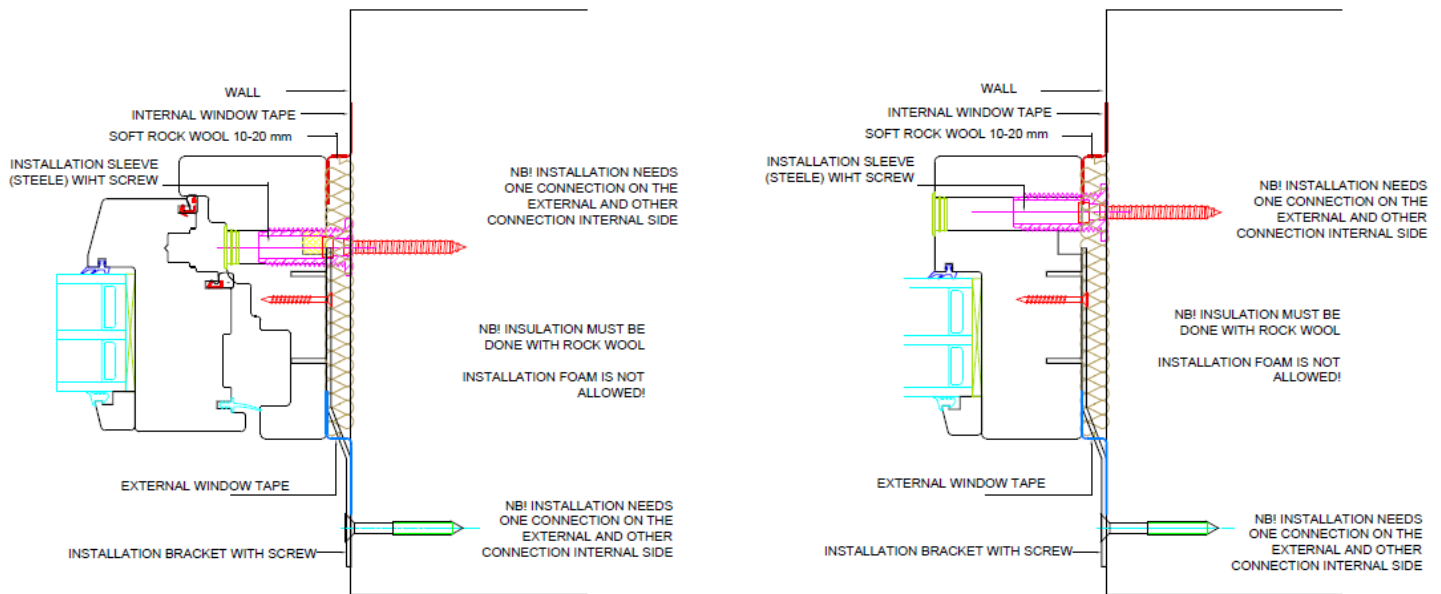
Joonis 9. Installation of SW14 Fireguard windows (NB! On this illustration due to confidentiality of window construction, the SW14 window with regular glass is used. The external dimensions of the frame and sash profiles match with the SW14 Fireguard windows.)
